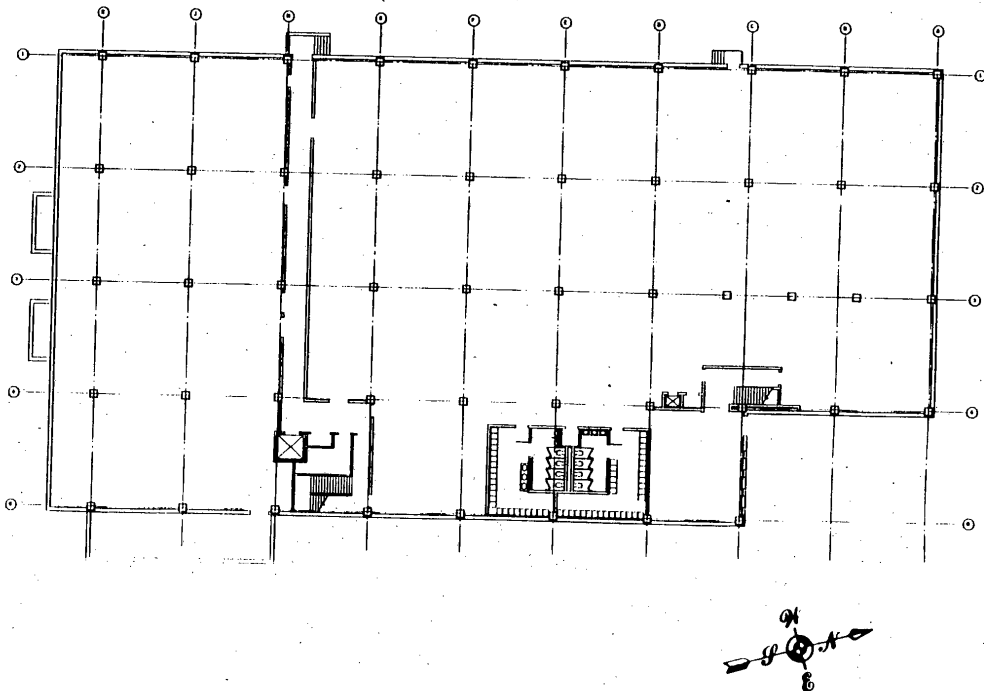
GROUND FLOOR P&PD BUILDING FLOOR PLAN
